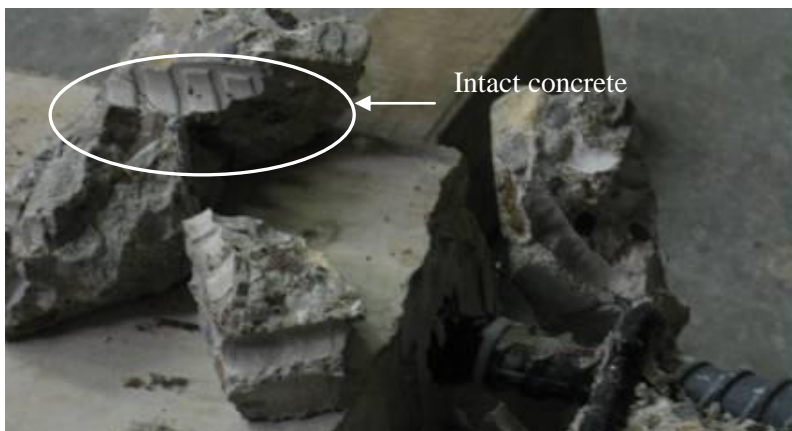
intact concrete taken from the anchorage zone from below the steel bar.
